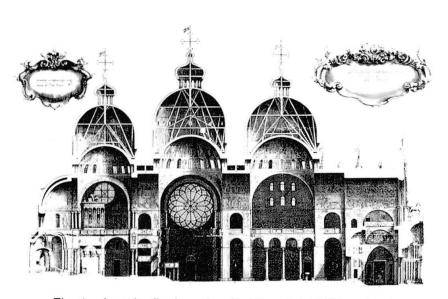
Longitudinal section (A. Visentini, XVIII century)
